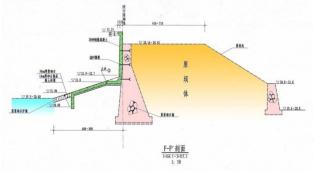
Cross section of the City Defence Dike (Anonymous, 2008)
